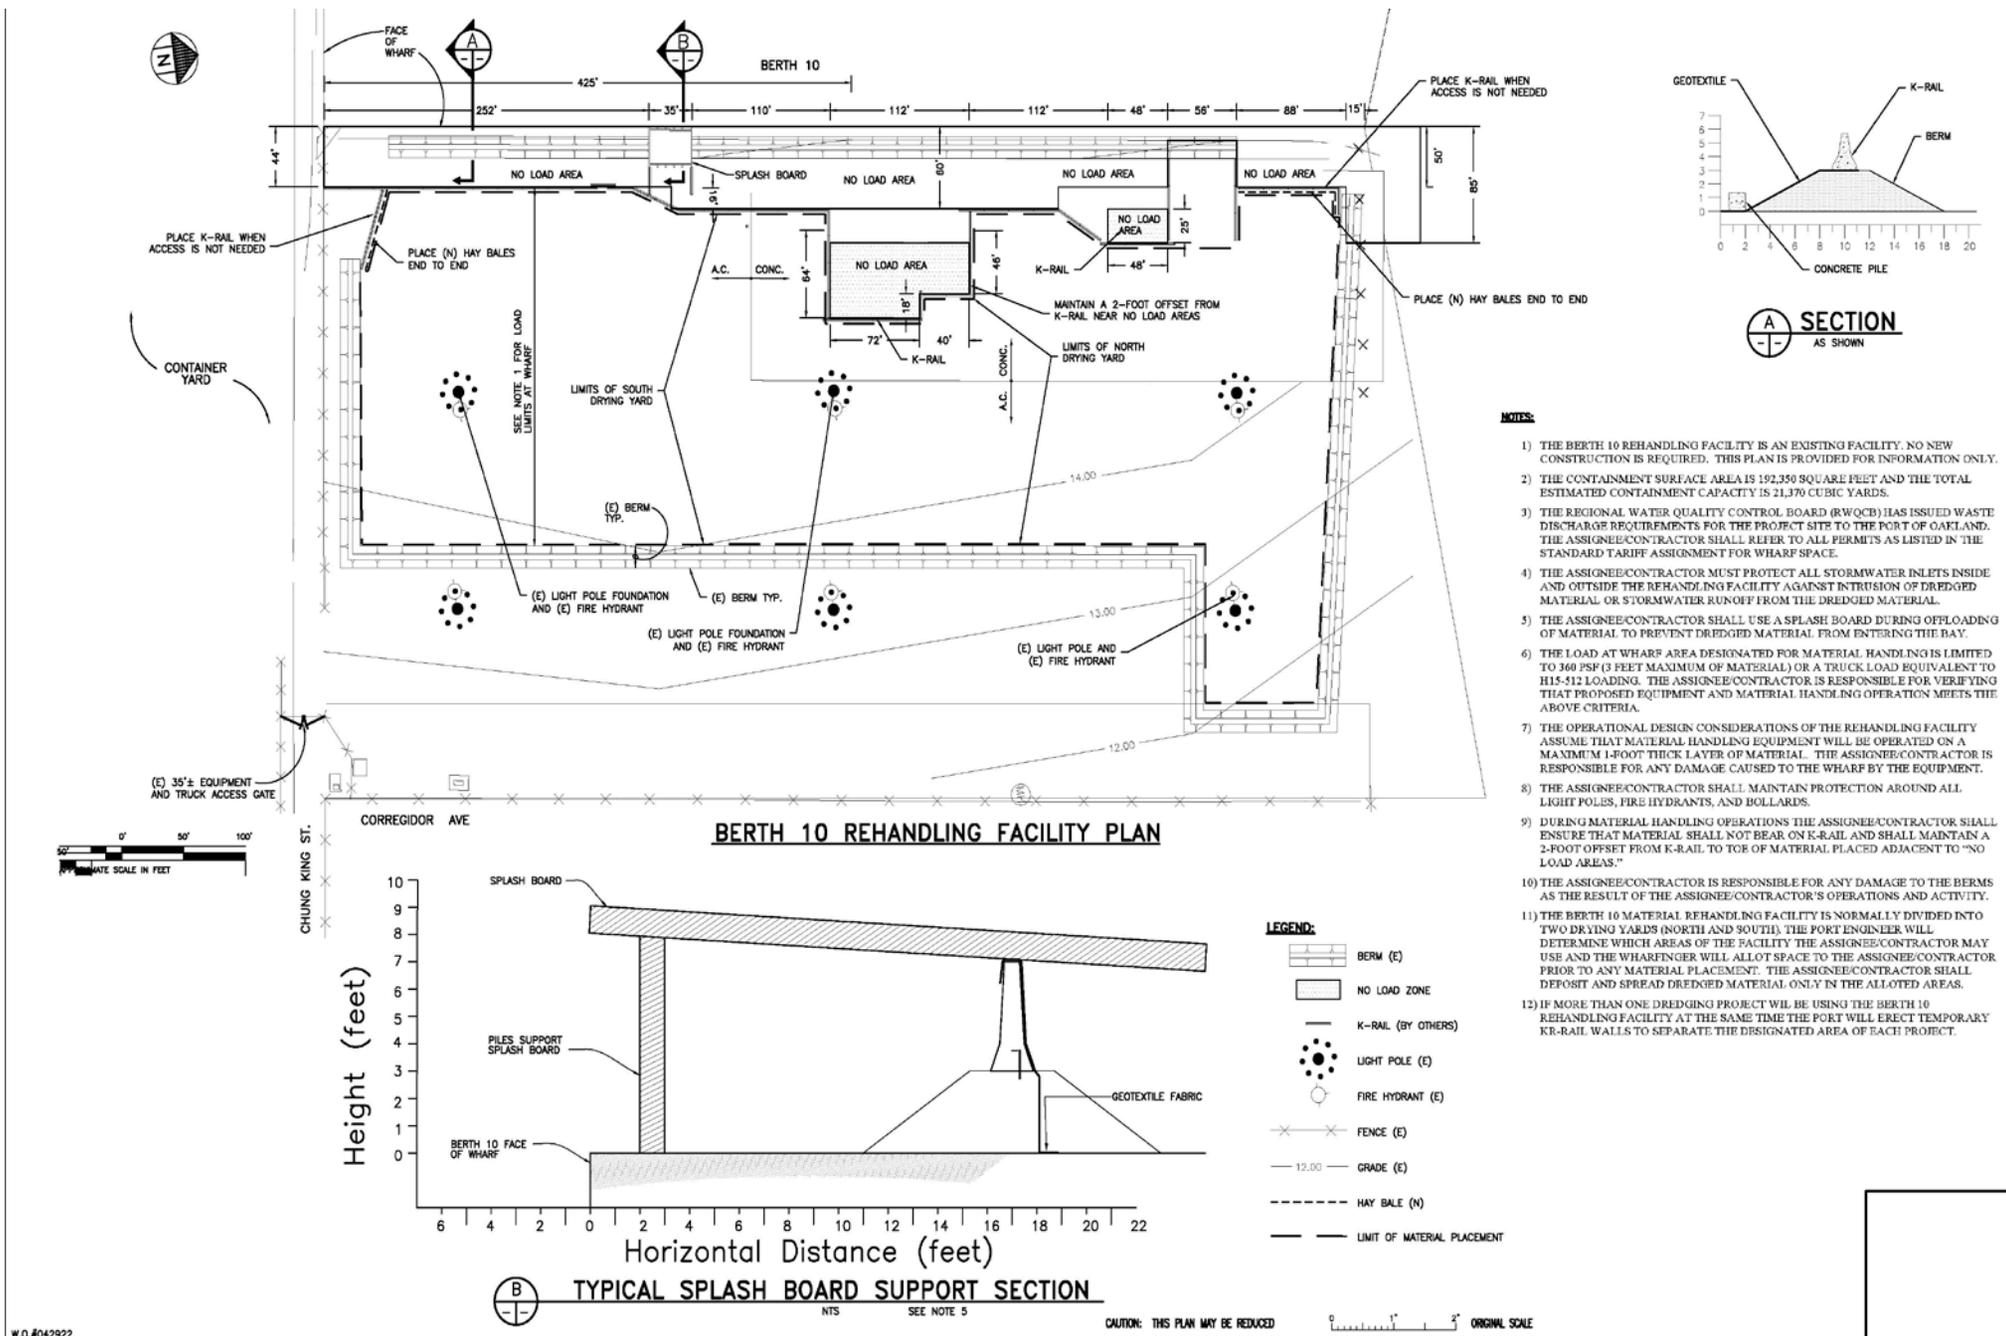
Port of Oakland Berth 10 Rehandling Facility Plan
